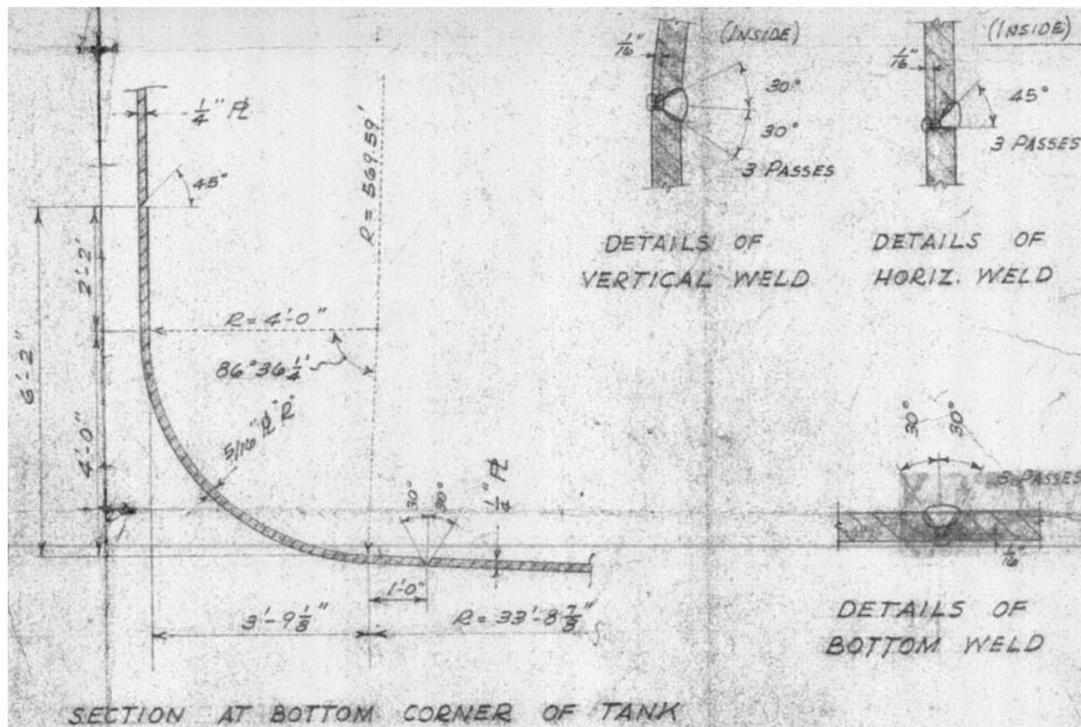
Construction Drawing for 241-B,-C,-T,-U, and -BX Farm, 100-Series, Type II Tanks Bottom Knuckle Weld (Drawing D-3)
